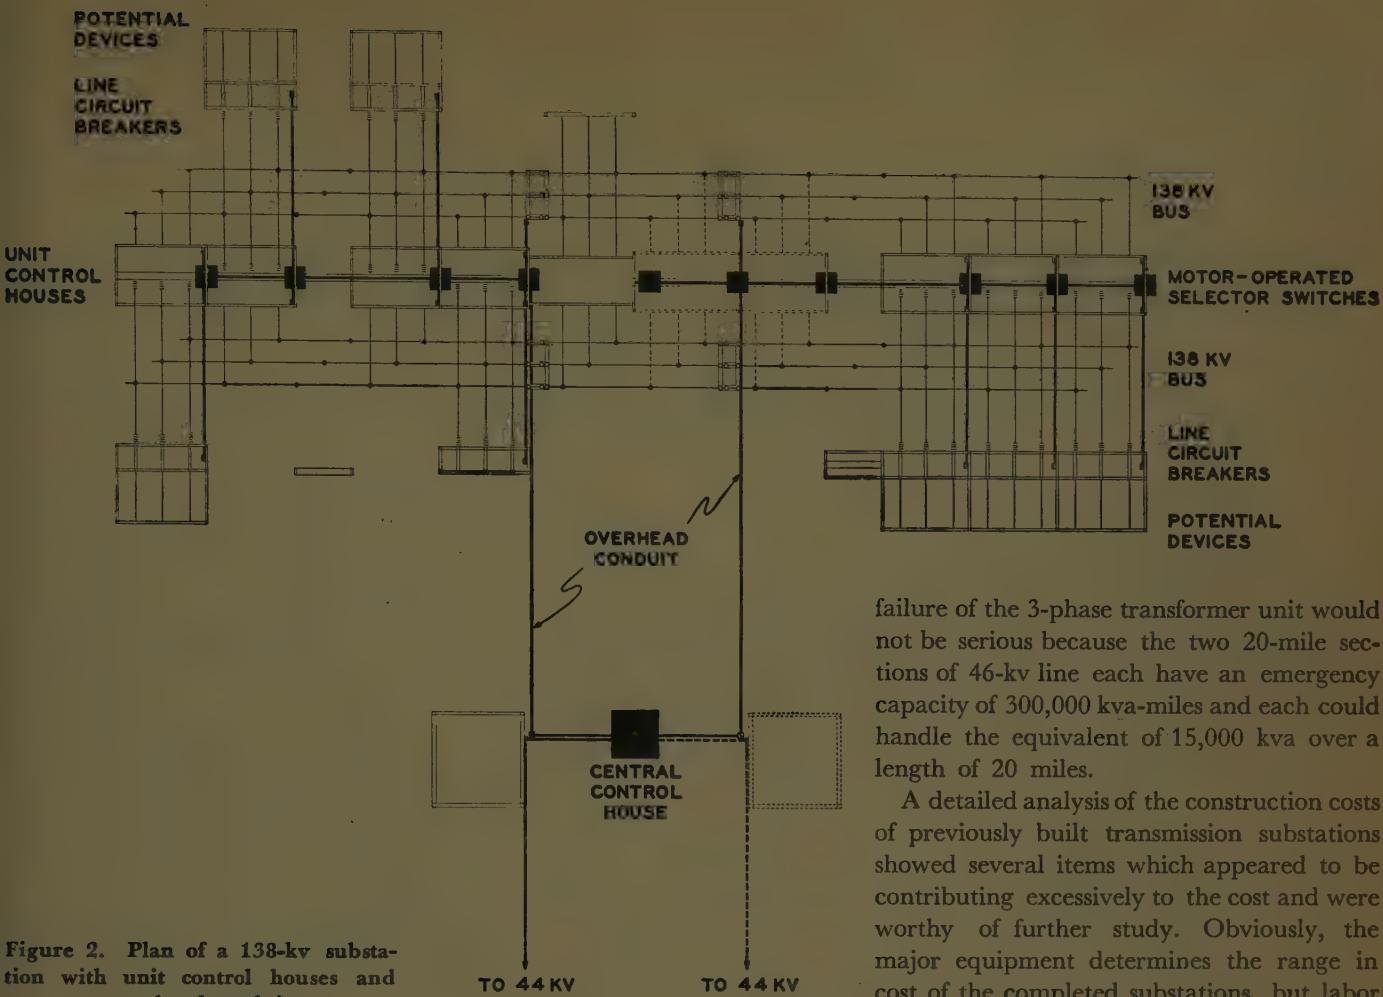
Plan of a 138-kv substation with unit control houses and overhead conduit
